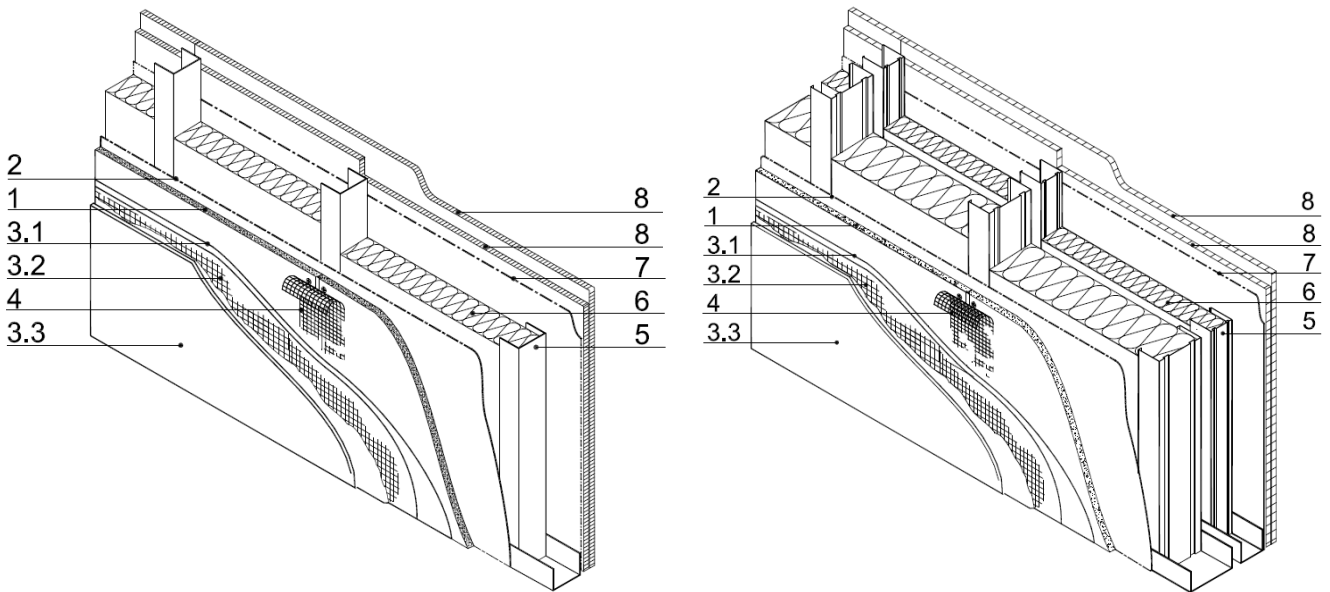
External wall with direct fastening of plates to steel frame:
